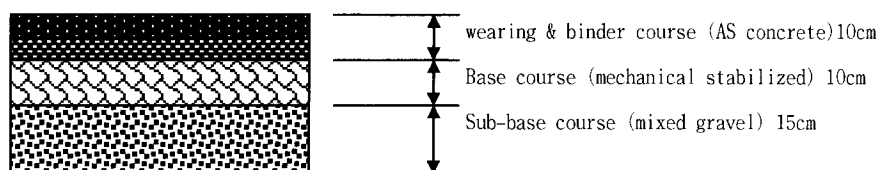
Actual Practice of New Pavement in UB City
